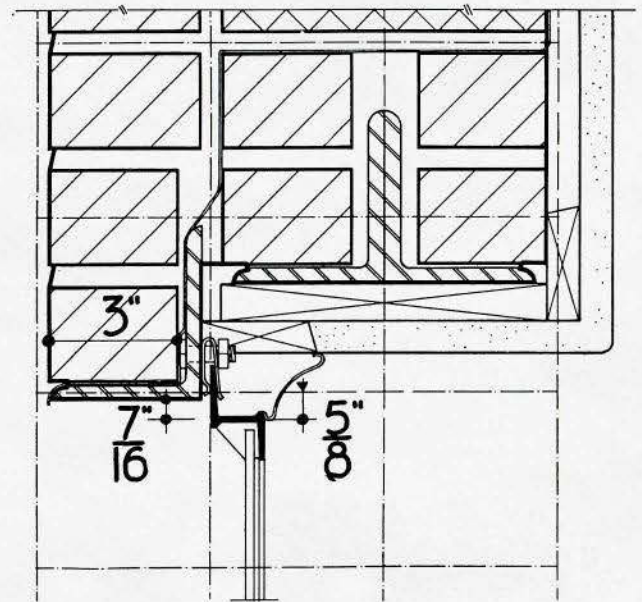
Masonry head detail with special 3-in. lintel brick used in stretcher or soldier position.
